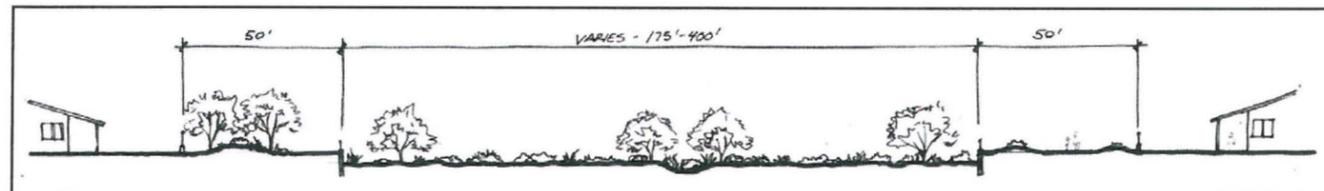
Concept Cross Section for Leveed Corridor with Walls & Landscape Compatibility Enhancements (Alternatives A, B1, B2, B4, B5) (Not to scale)
